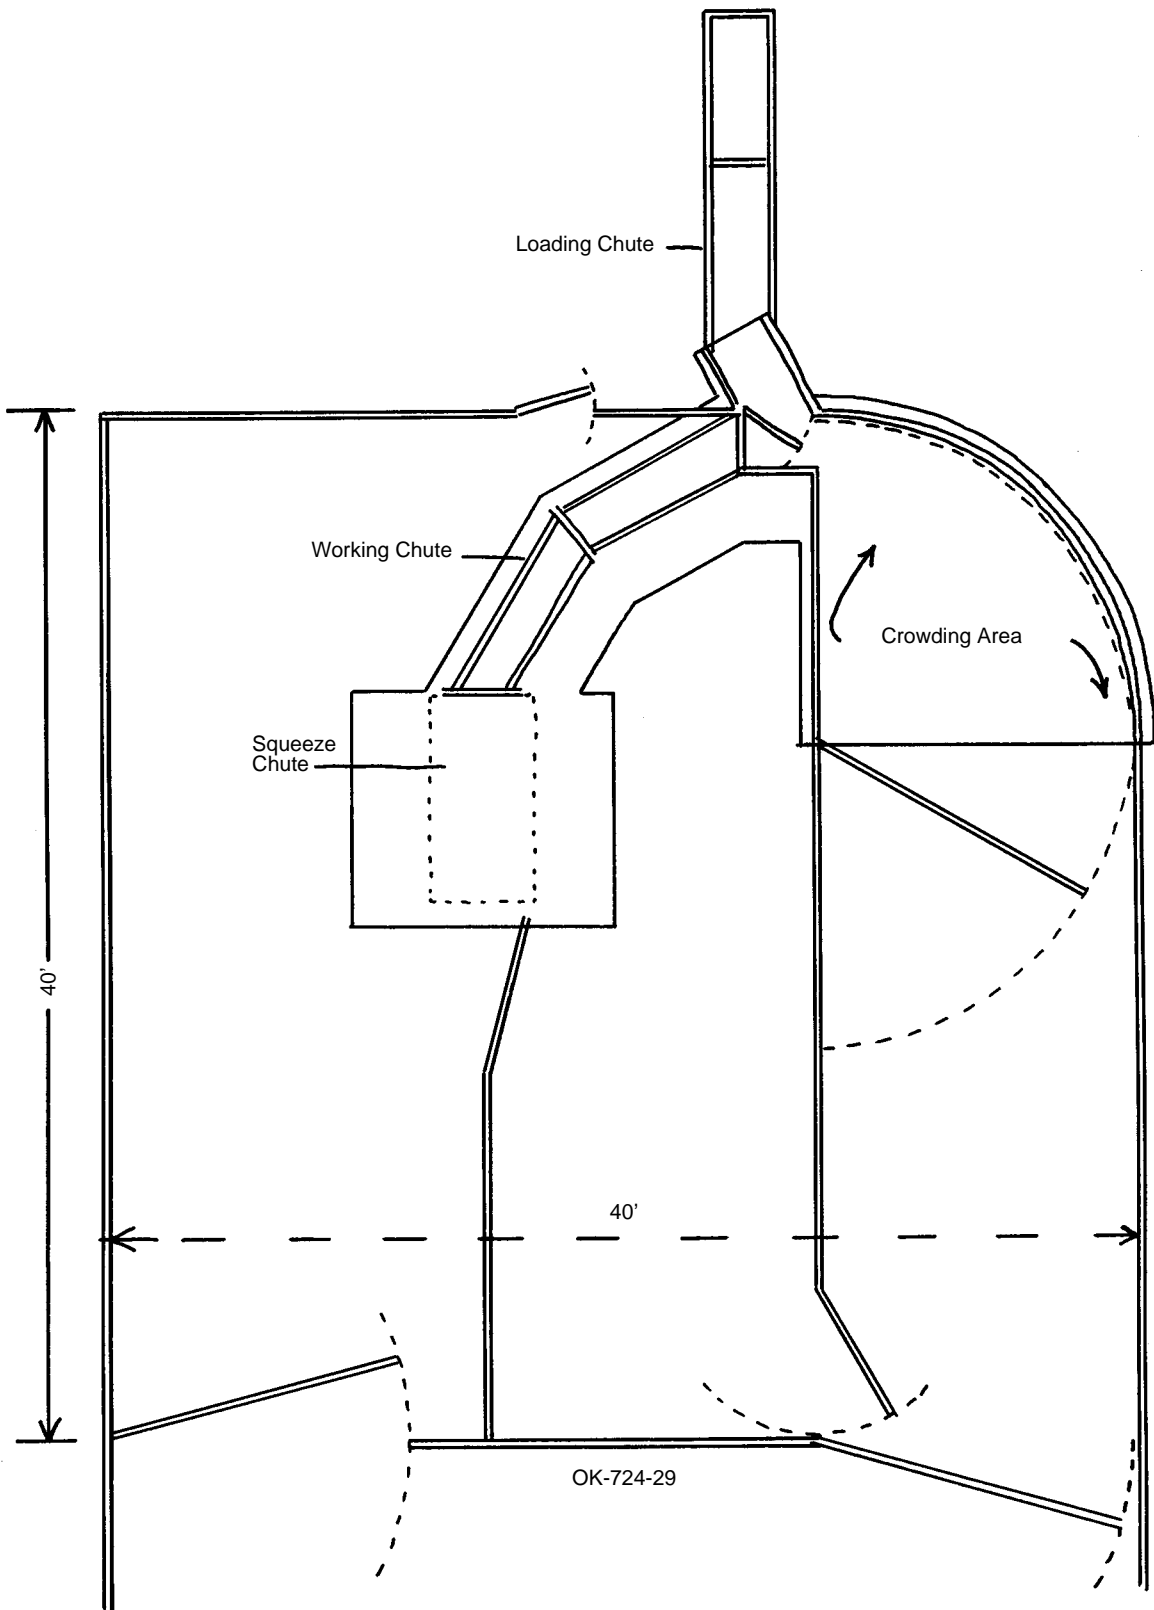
USDA corral plan 6230 has a circular crowding pen and working chute for 25-75 head and a good layout for loading and sorting.
